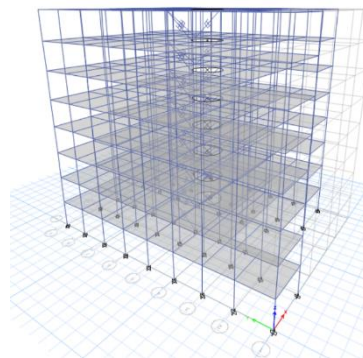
Building with Viscous Damper of different forces at middle bays of each story
